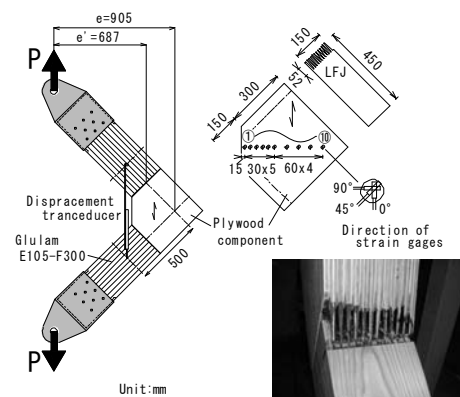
Improved LFJ corner joint test and finger joint inside of plywood type.
